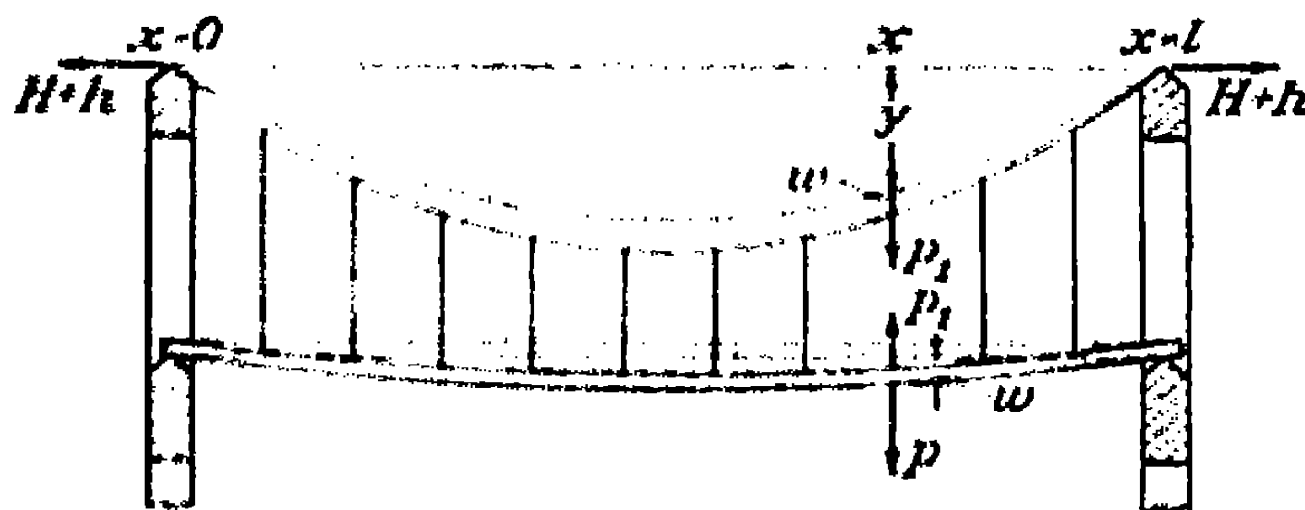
Deflection of the truss and cable of a suspension bridge.
